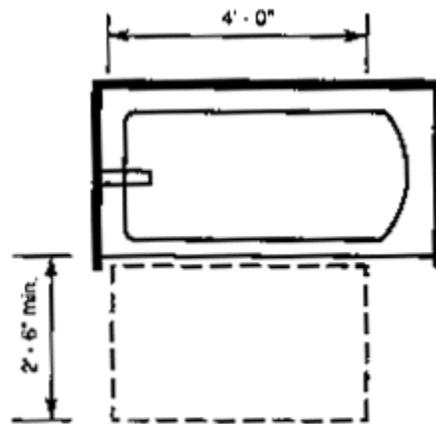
Alternative Specification - Clear Floor Space at Bathtub
